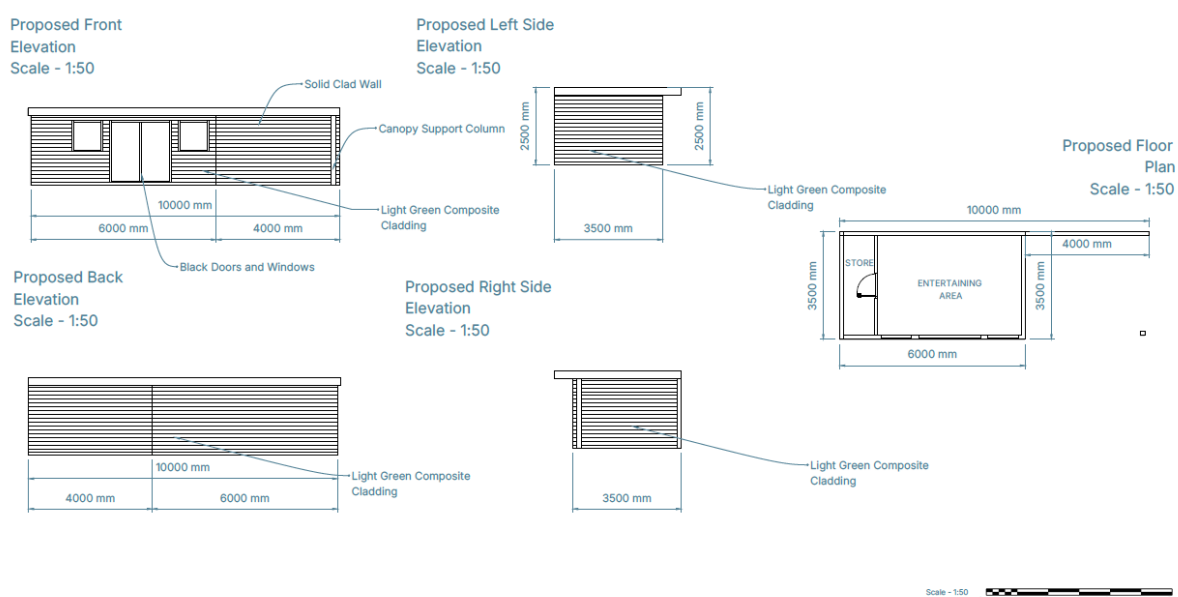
Proposed Garden Room – Elevations and Floorplan, BD19 4HX
